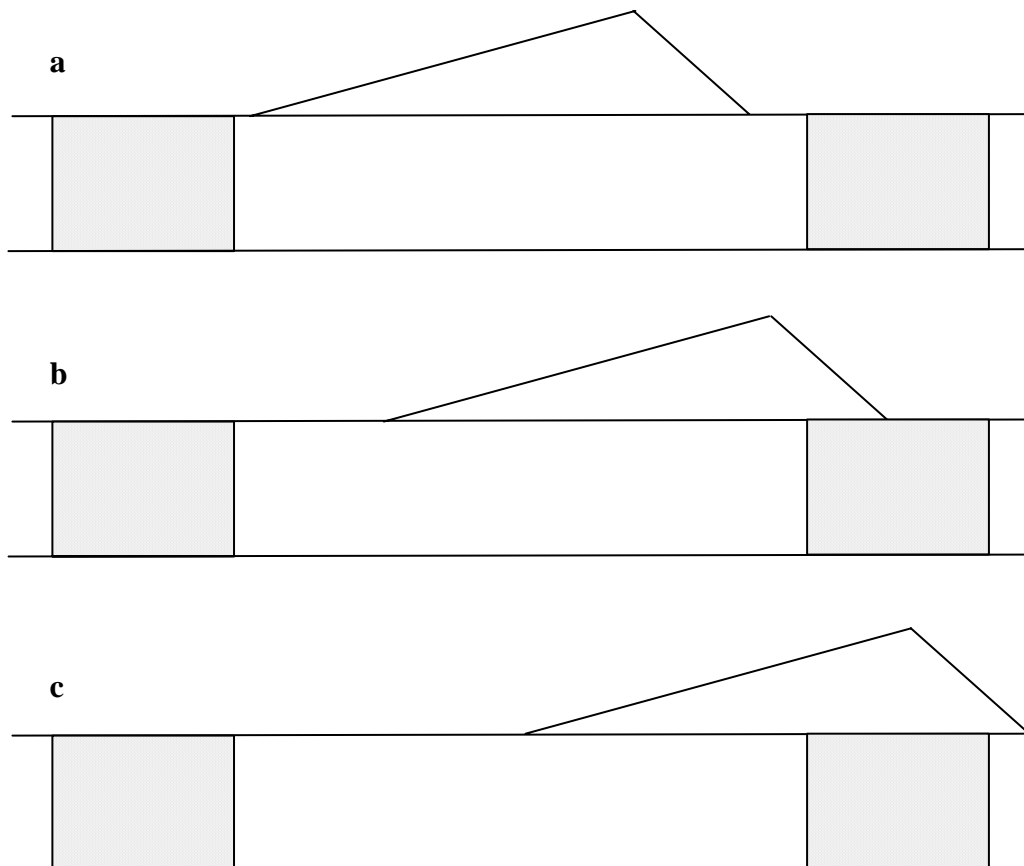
Schematic showing potential for a large hangingwall instability: (a) high probability as wedge occurs in between pillars; (b) cantilever failure possible; (c) wedge failure unlikely
